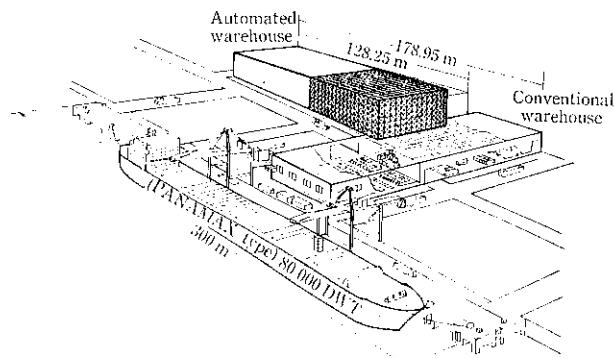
Conceptual design of the new material handling facilities at Chiba Works
